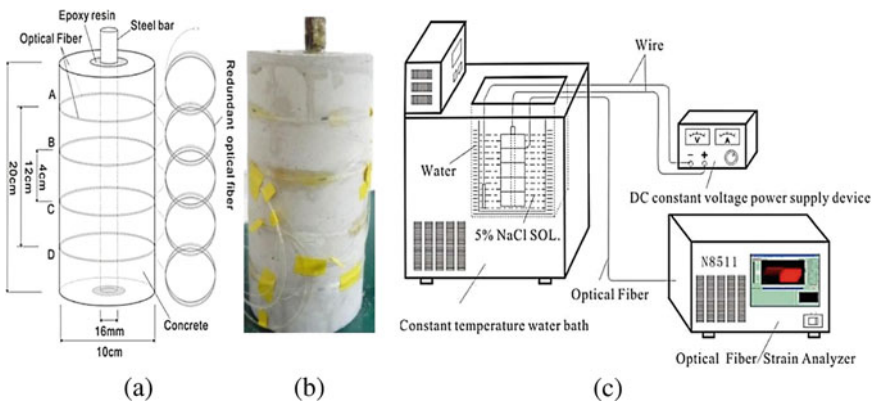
a Schematic diagram of fibre laying, b sample specimen, and c test setup [28]
